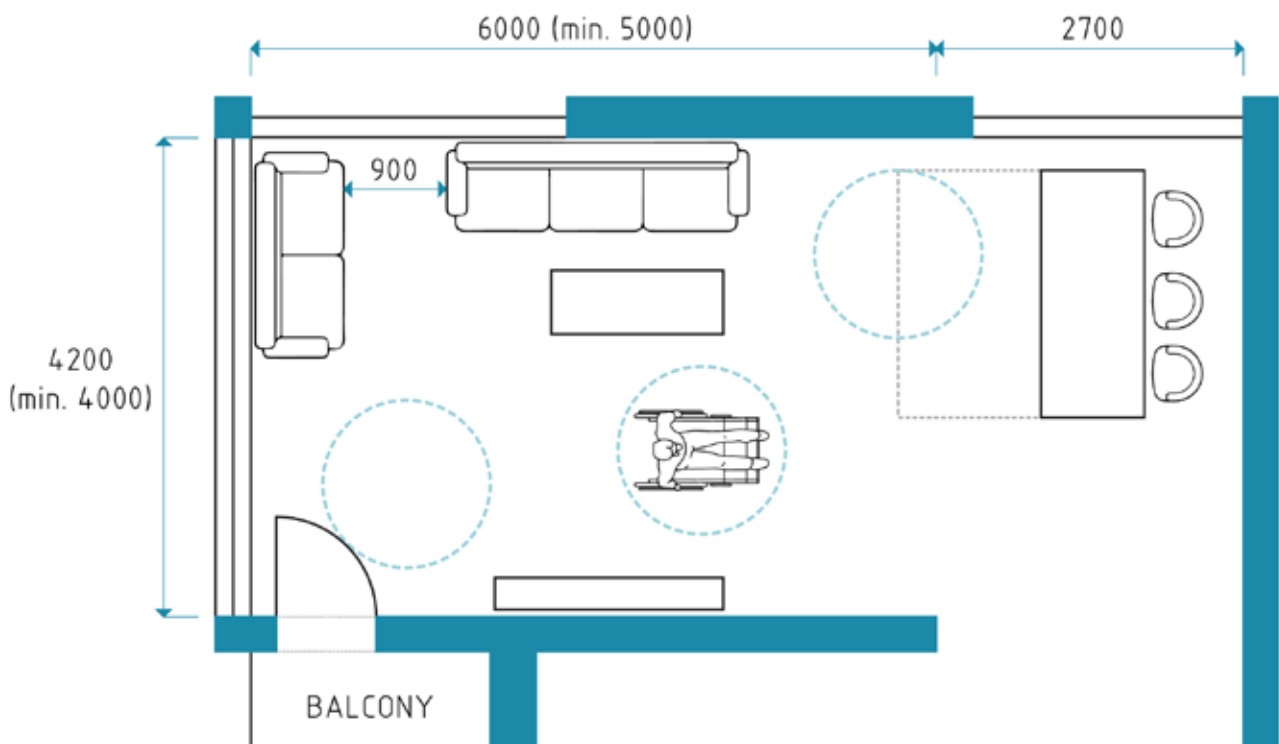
Illustrative floor plan of an accessible living room (Lacho, Suláková)
